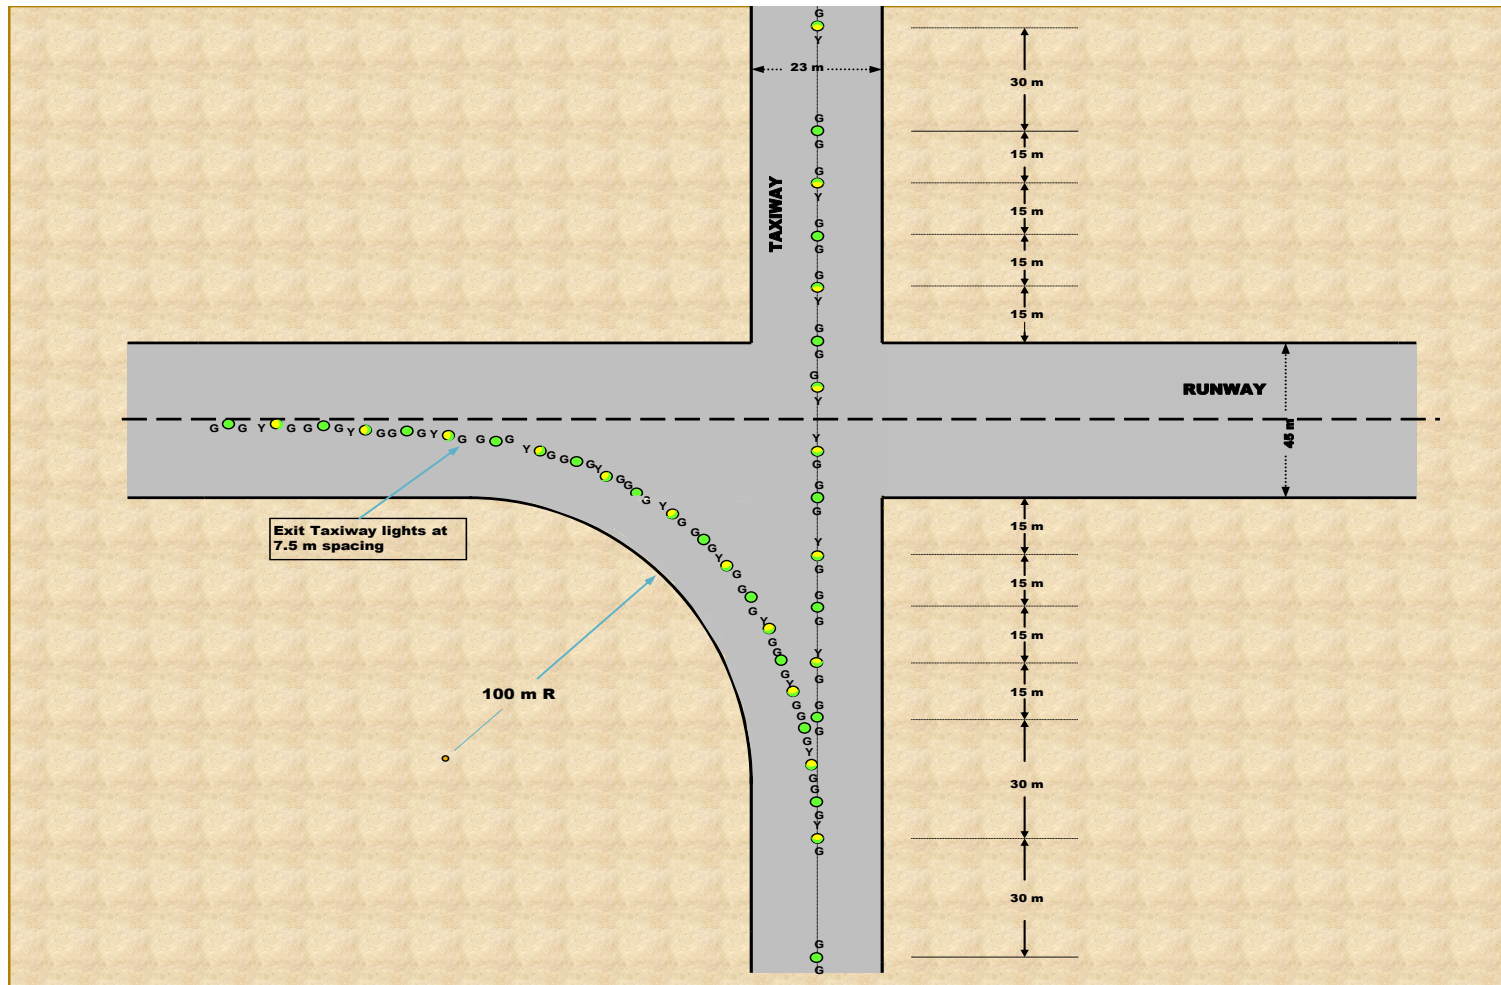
(b): Typical Taxiway Centreline Lights Layout
